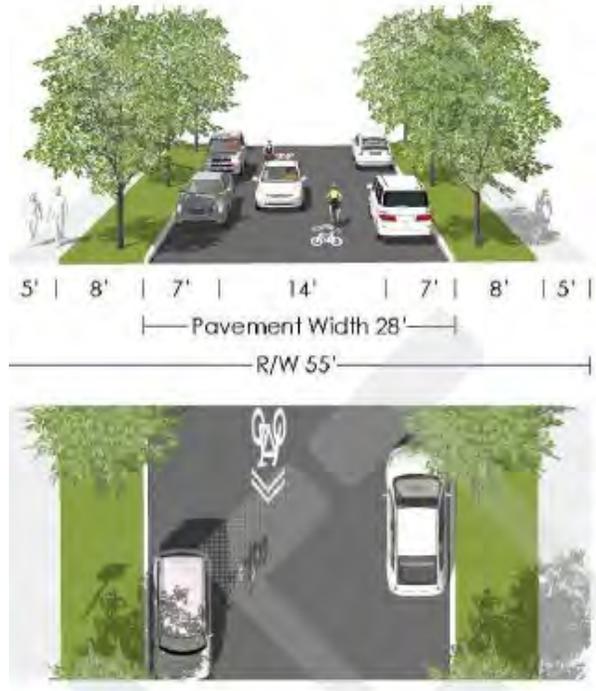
Proposed Minor Residential Street Cross-Section (Neighborhood Bikeway)
